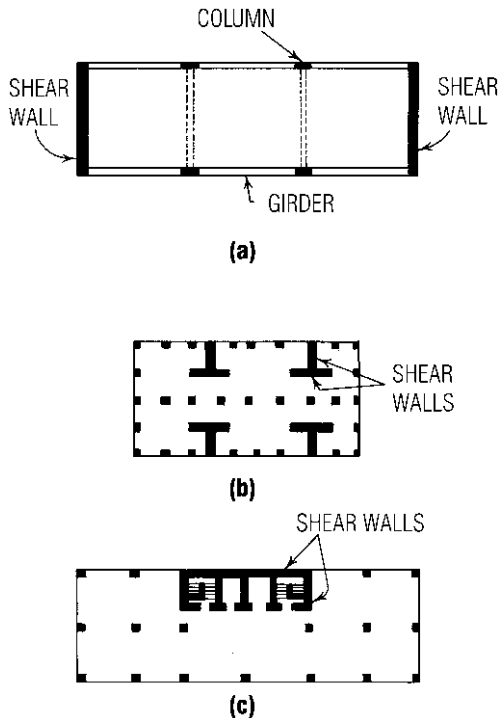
Arrangements of shear walls for resisting lateral forces.
